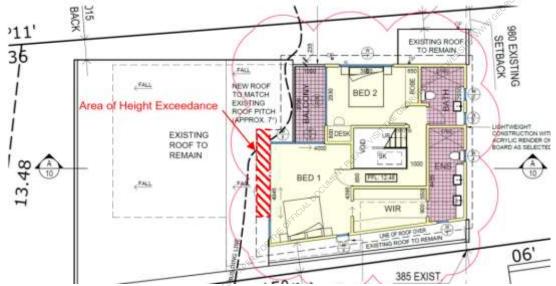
Floor Plan highlighting extent of height of building development standard variation
